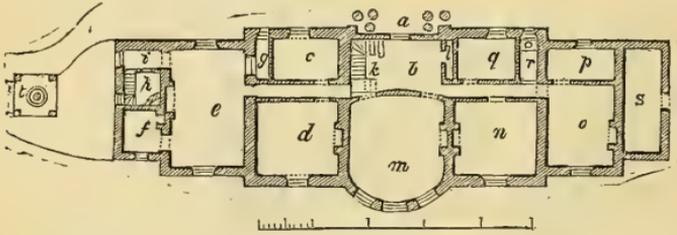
Ground Plan of the principal Floor of Annat Lodge.
